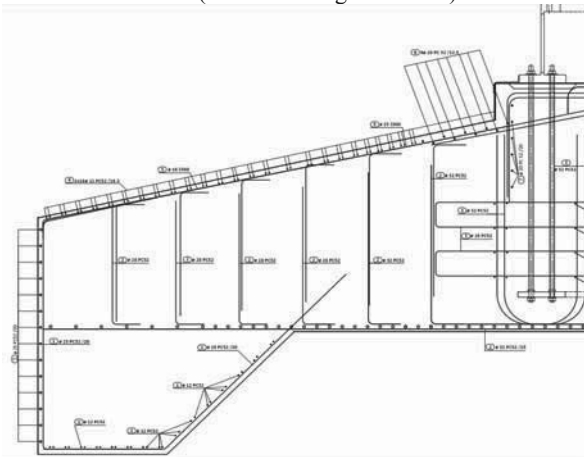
Transversal section of reinforced concrete foundation with skirt.
